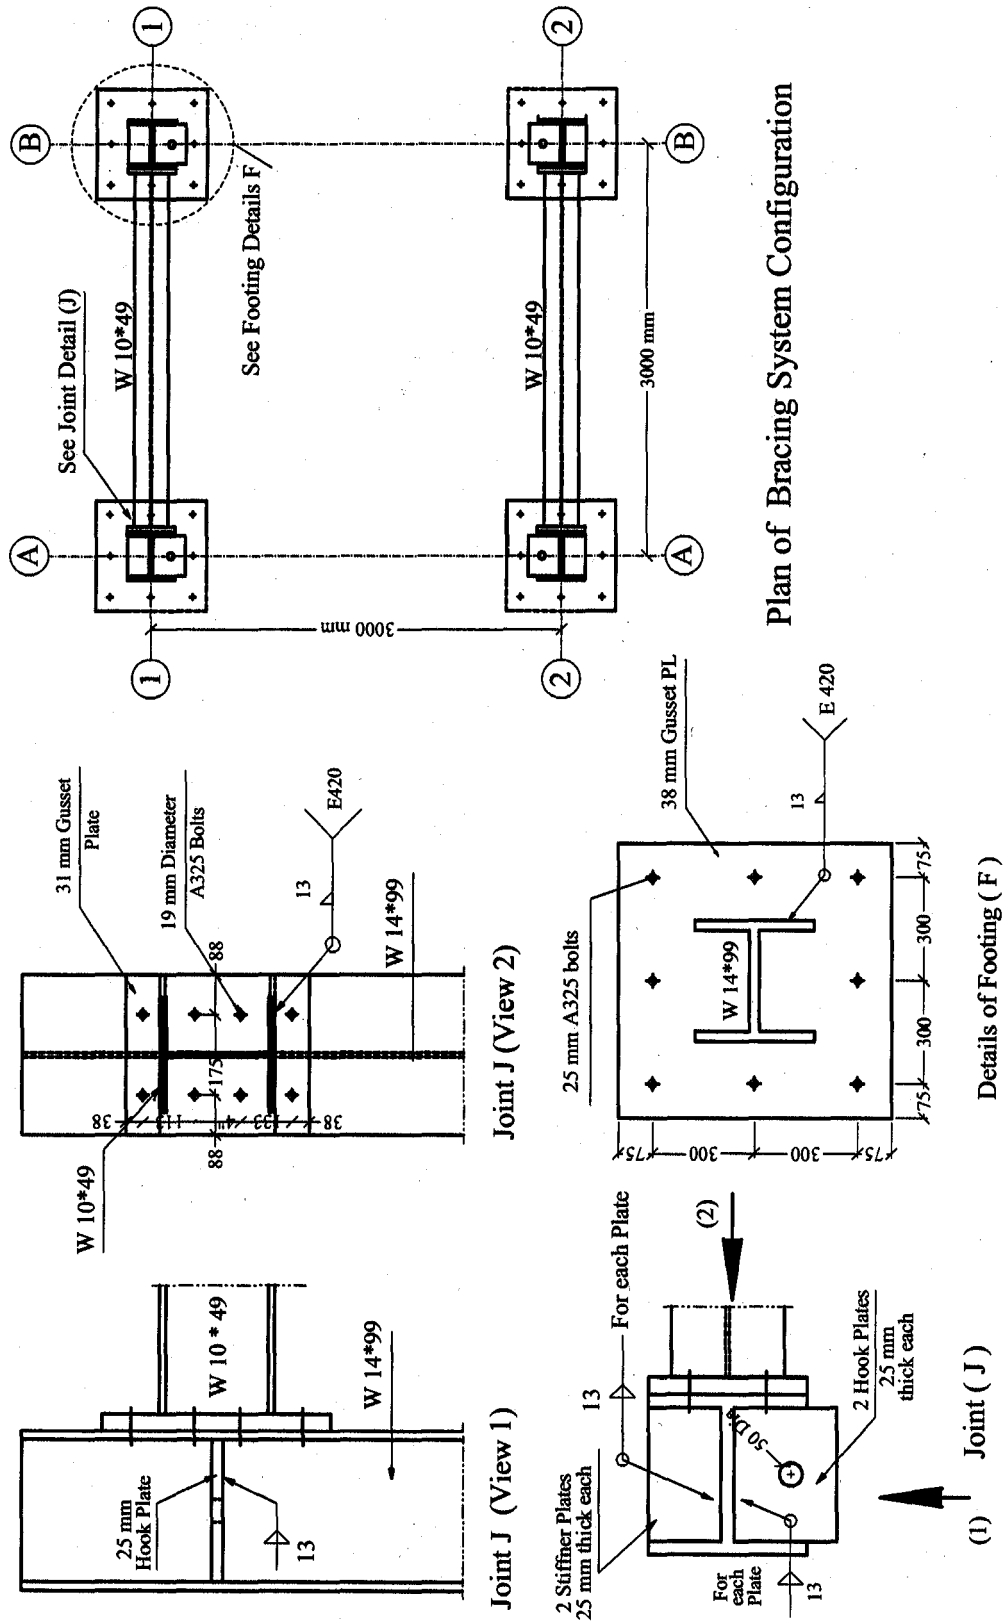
Section Details of Steel Stability System (Metric Units)
